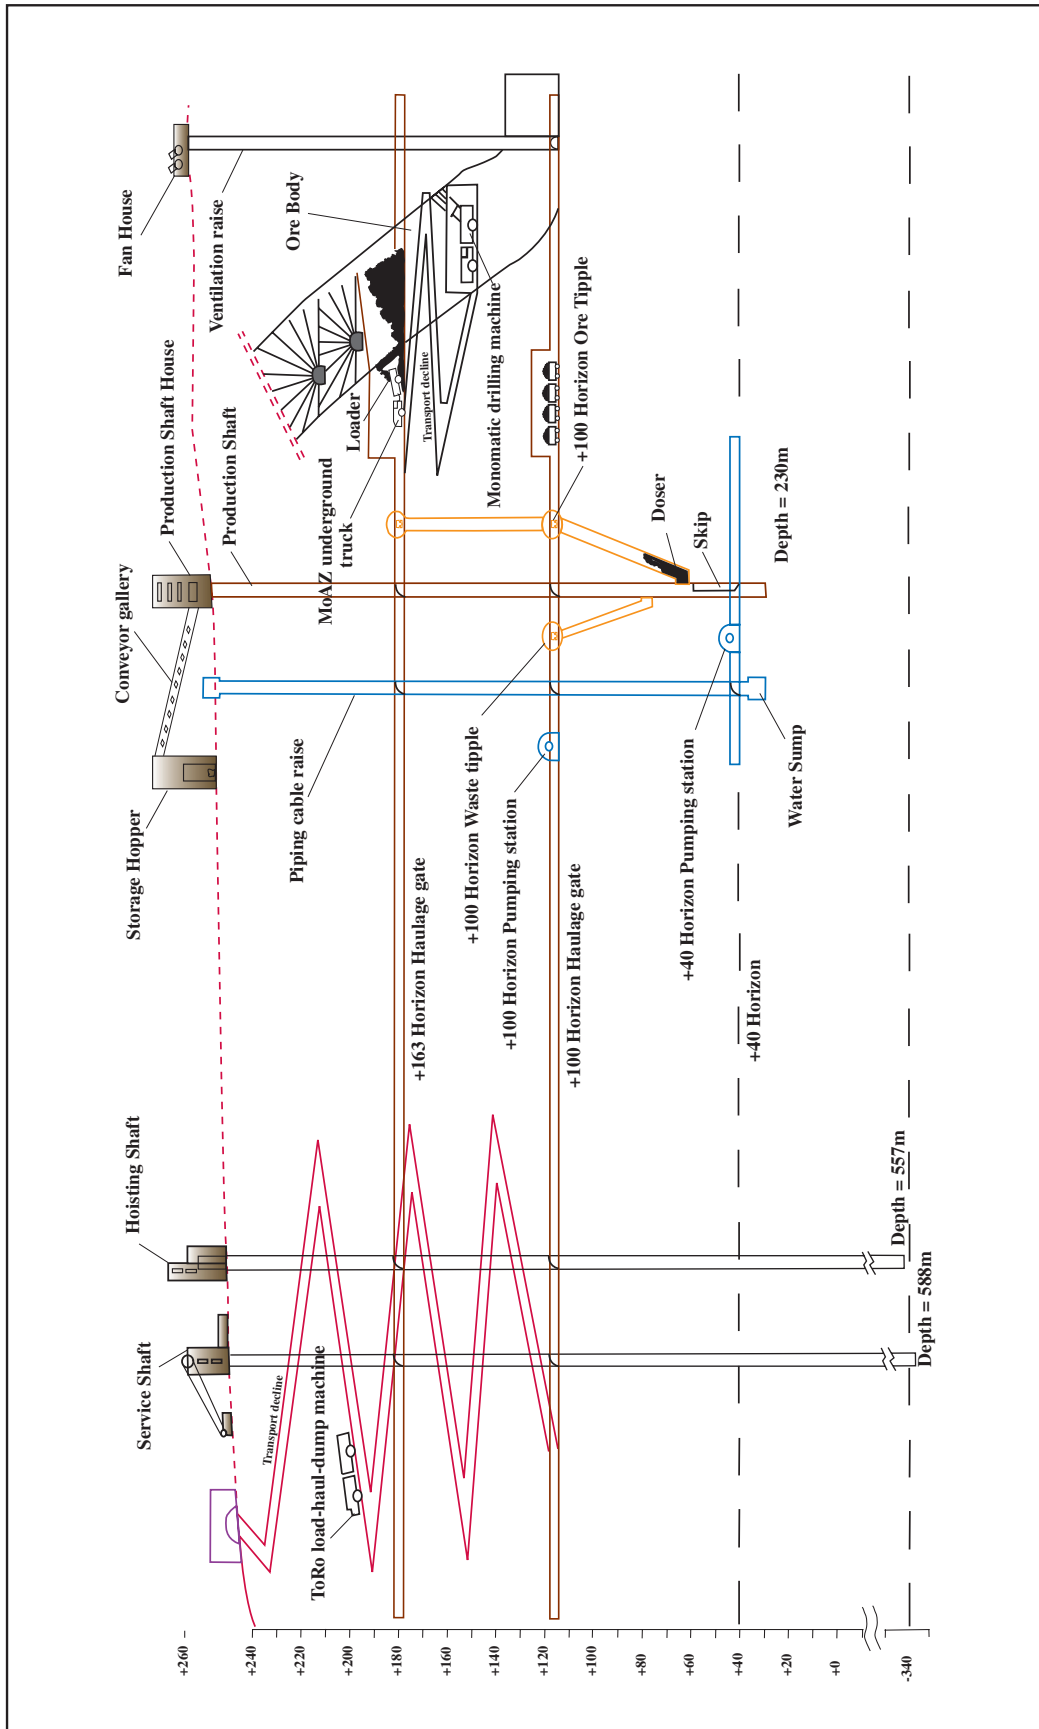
Shalkiya Mine Generalised Underground Infrastructure Arrangement
